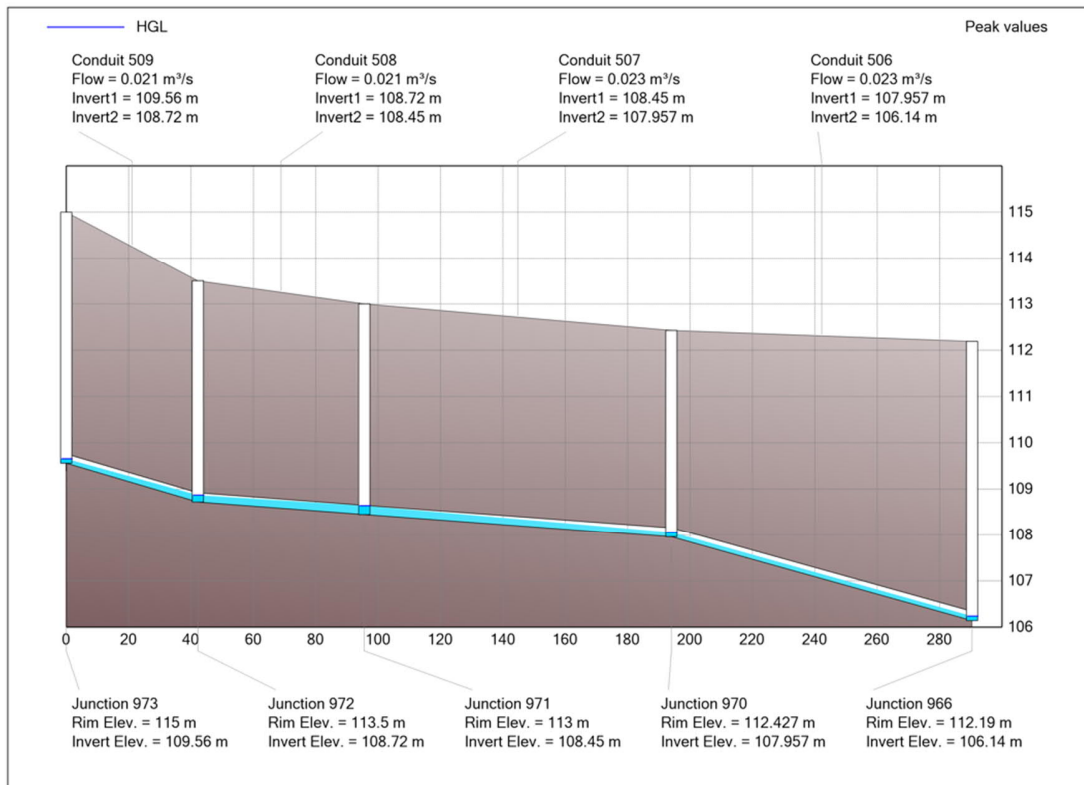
Profile View from Manhole 973 to Manhole 966-Existing Condition.
